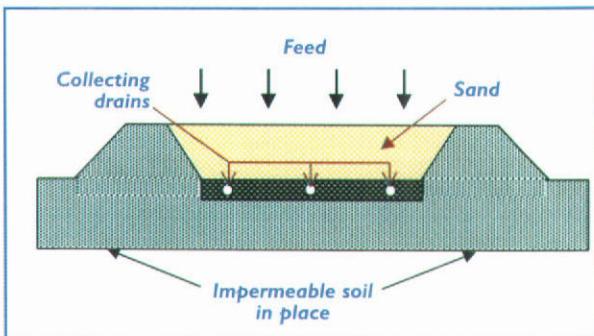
Drained system with impermeable soil in place (Agences de l'Eau, 1993)
